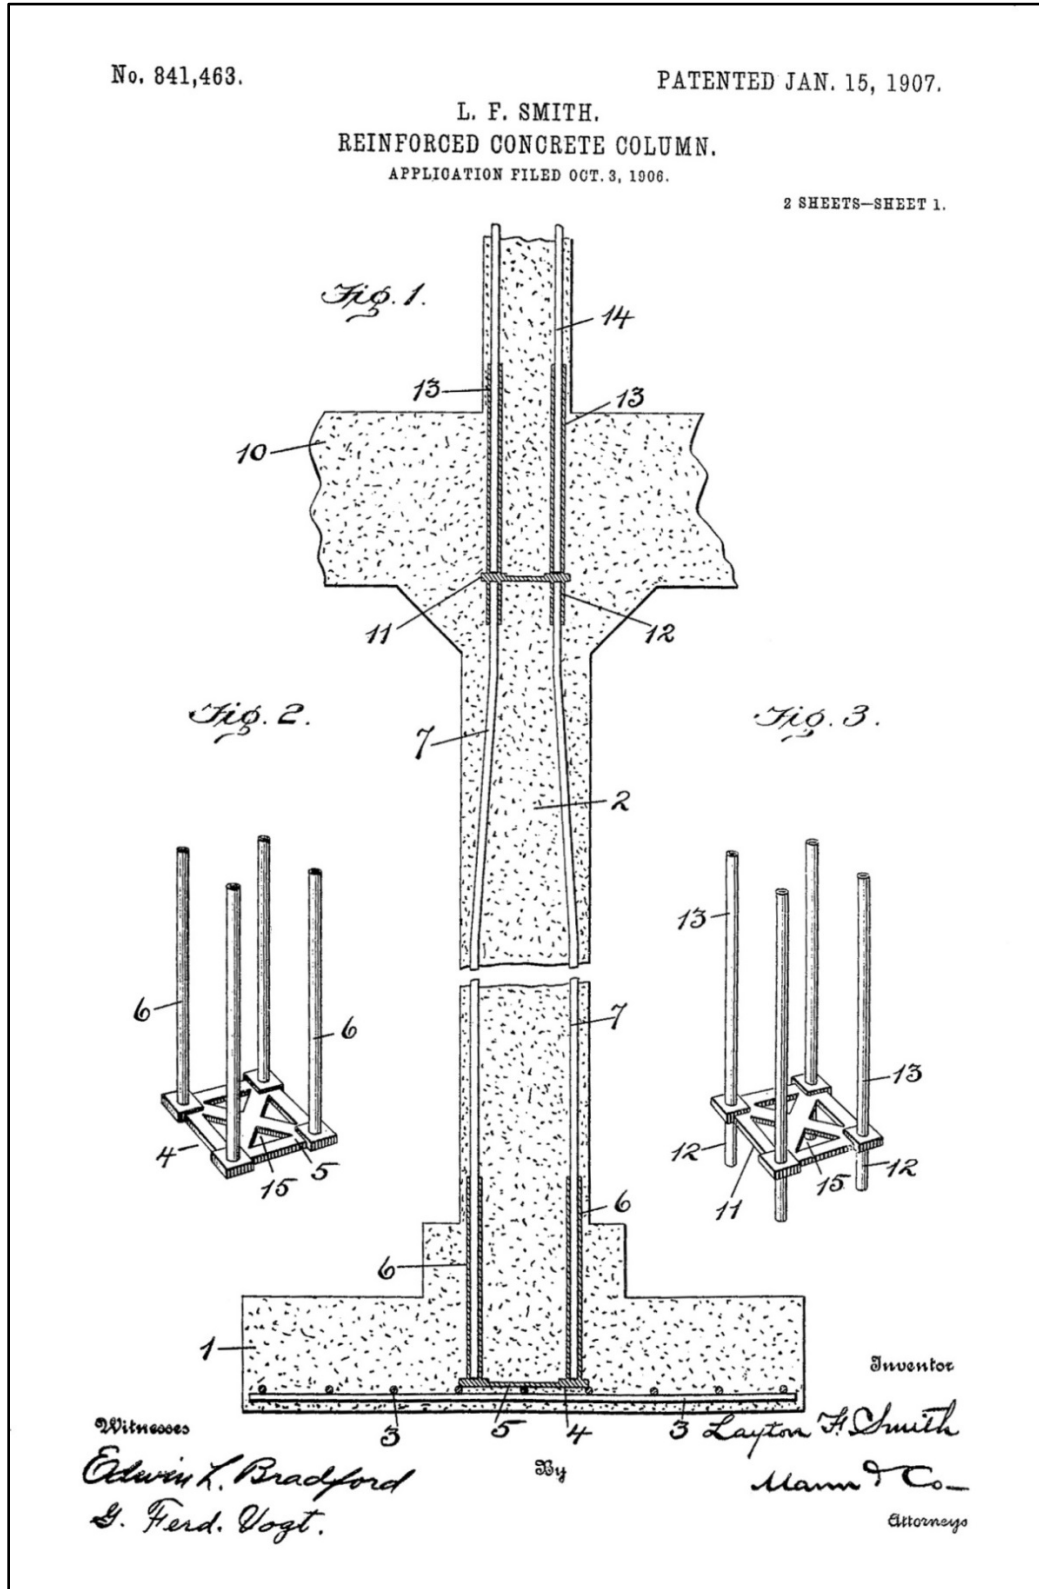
Layton F. Smith, illustration from patent # 841,463 for reinforced concrete column. Source: U.S. Patent and Trademark Office.
